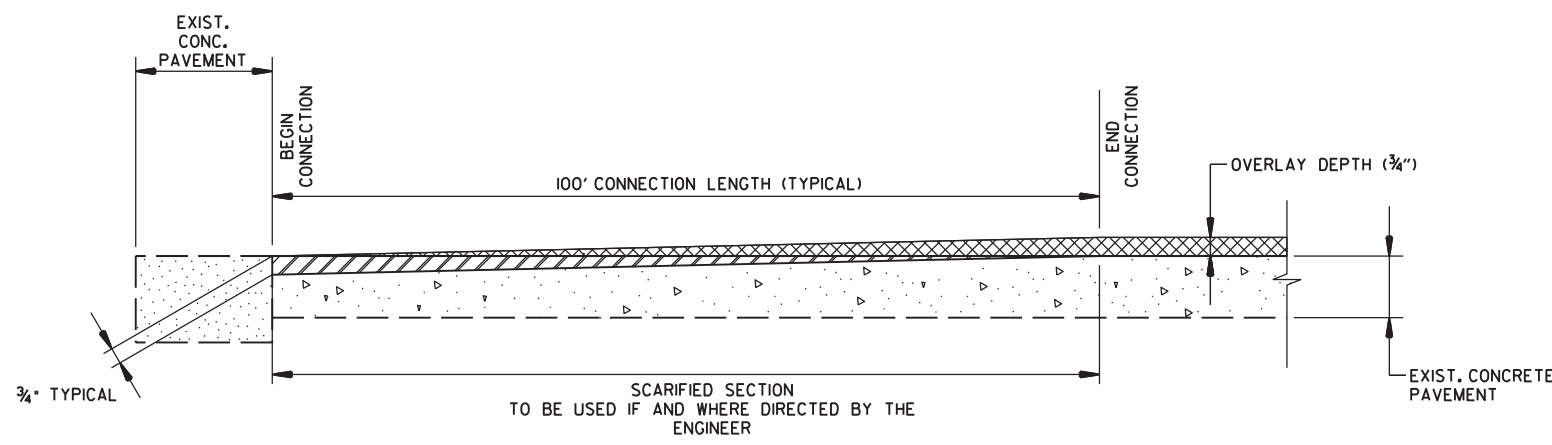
DETAIL FOR EXISTING ASPHALT PAVEMENT TRANSITIONS - RAMP
